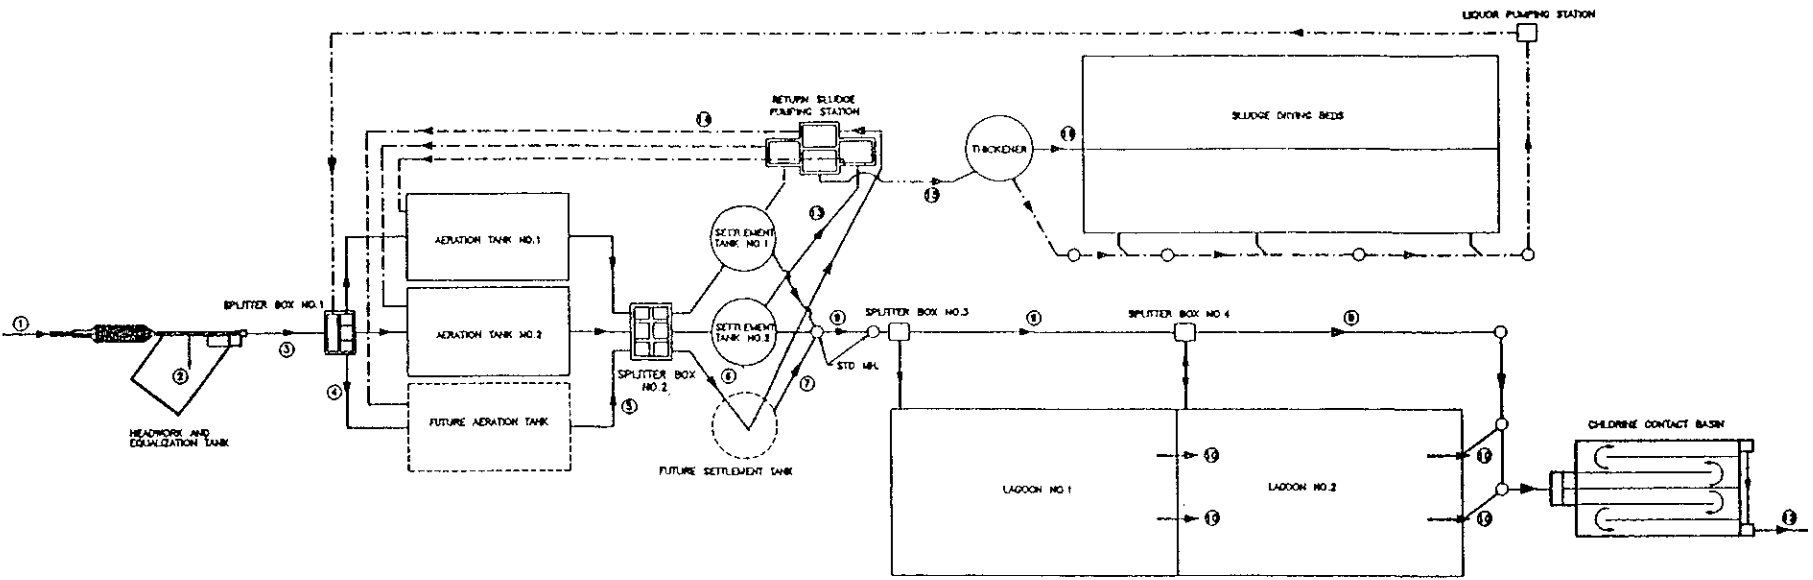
Schematic Layout of Fuhis Wastewater Treatment Plant
